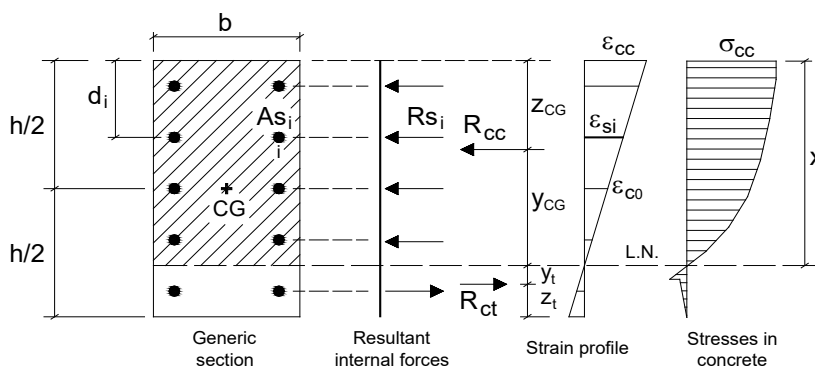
Generic rectangular section - strains, stresses in concrete and internal resultant forces
